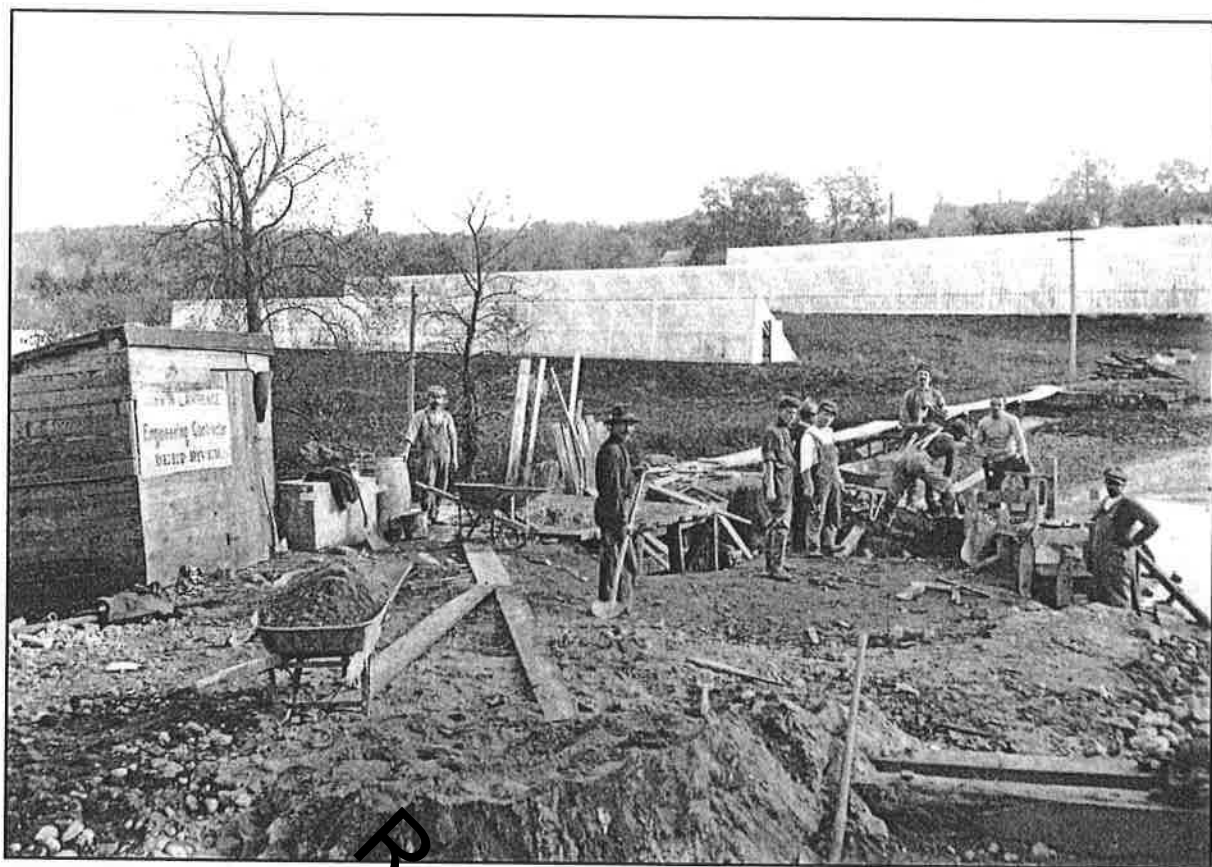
Building Dam at Lower Factory, ca. 1915—Note Bleach houses in background
